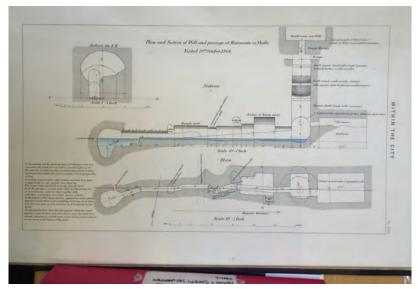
A plan of a section of the wall and passage at Hammam es Shefa, Warren Expedition 1864.
